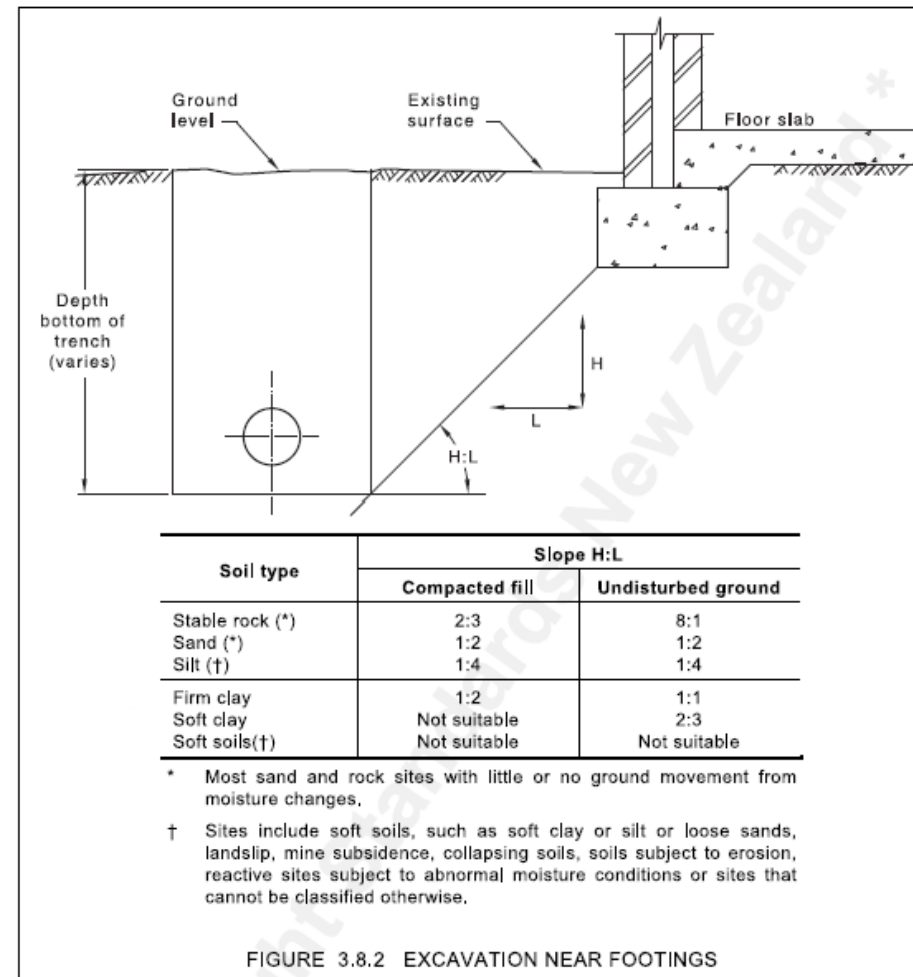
EXCAVATION NEAR FOOTINGS
